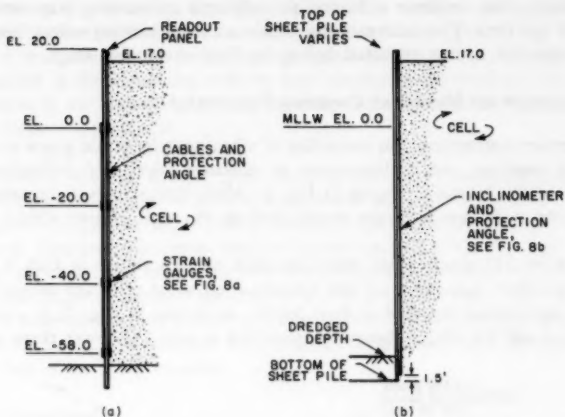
Instrumentation—Typical Sections (a) Strain Gauge Sheet (b) Inclinator Sheet (1 ft = 0.305 m)
